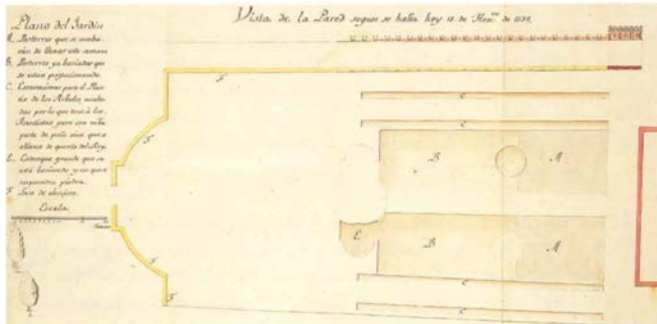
Leandro Bachelieu, Plan of the state of excavations for the Parterre and front elevation of its closing wall at the height it was situated on January, 13, 1734. (A.G.P.)
